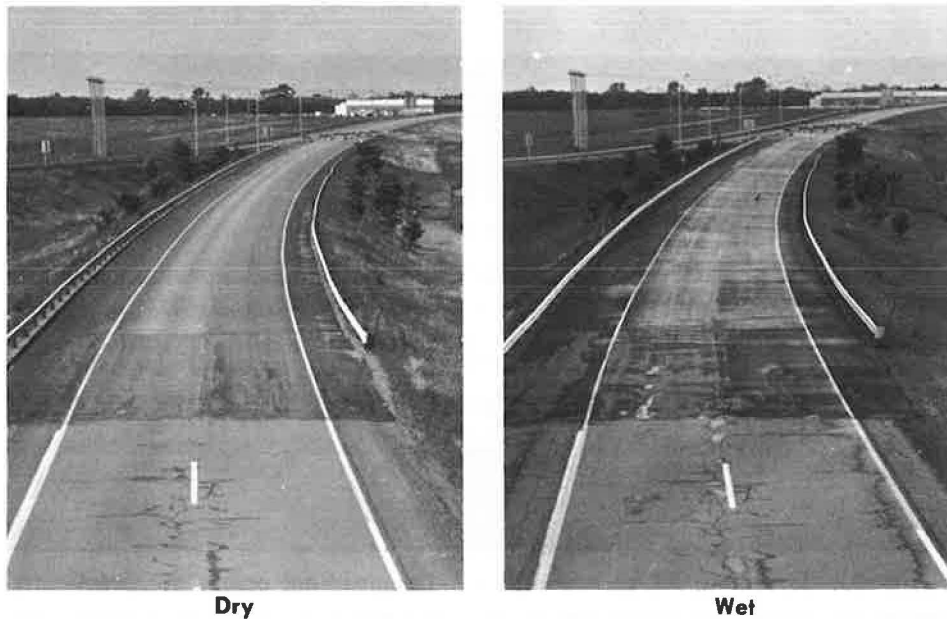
Two views of a pavement overlay in a wet and dry condition. Most of the 16 reflection cracks developed between the end of the taper and the off-ramp barricade could be seen when the pavement was wet but practically none when it was dry.
